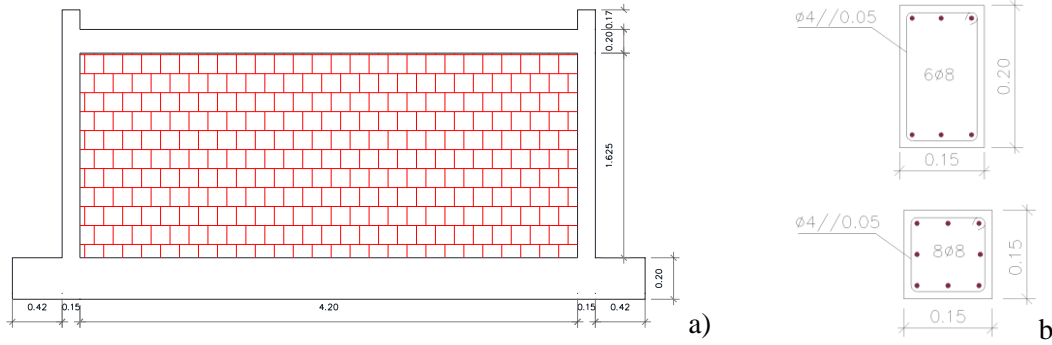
Single-story single-bay infilled masonry RC frame: a) frame geometry b) Cross sections dimensions and detailing of RC elements.
